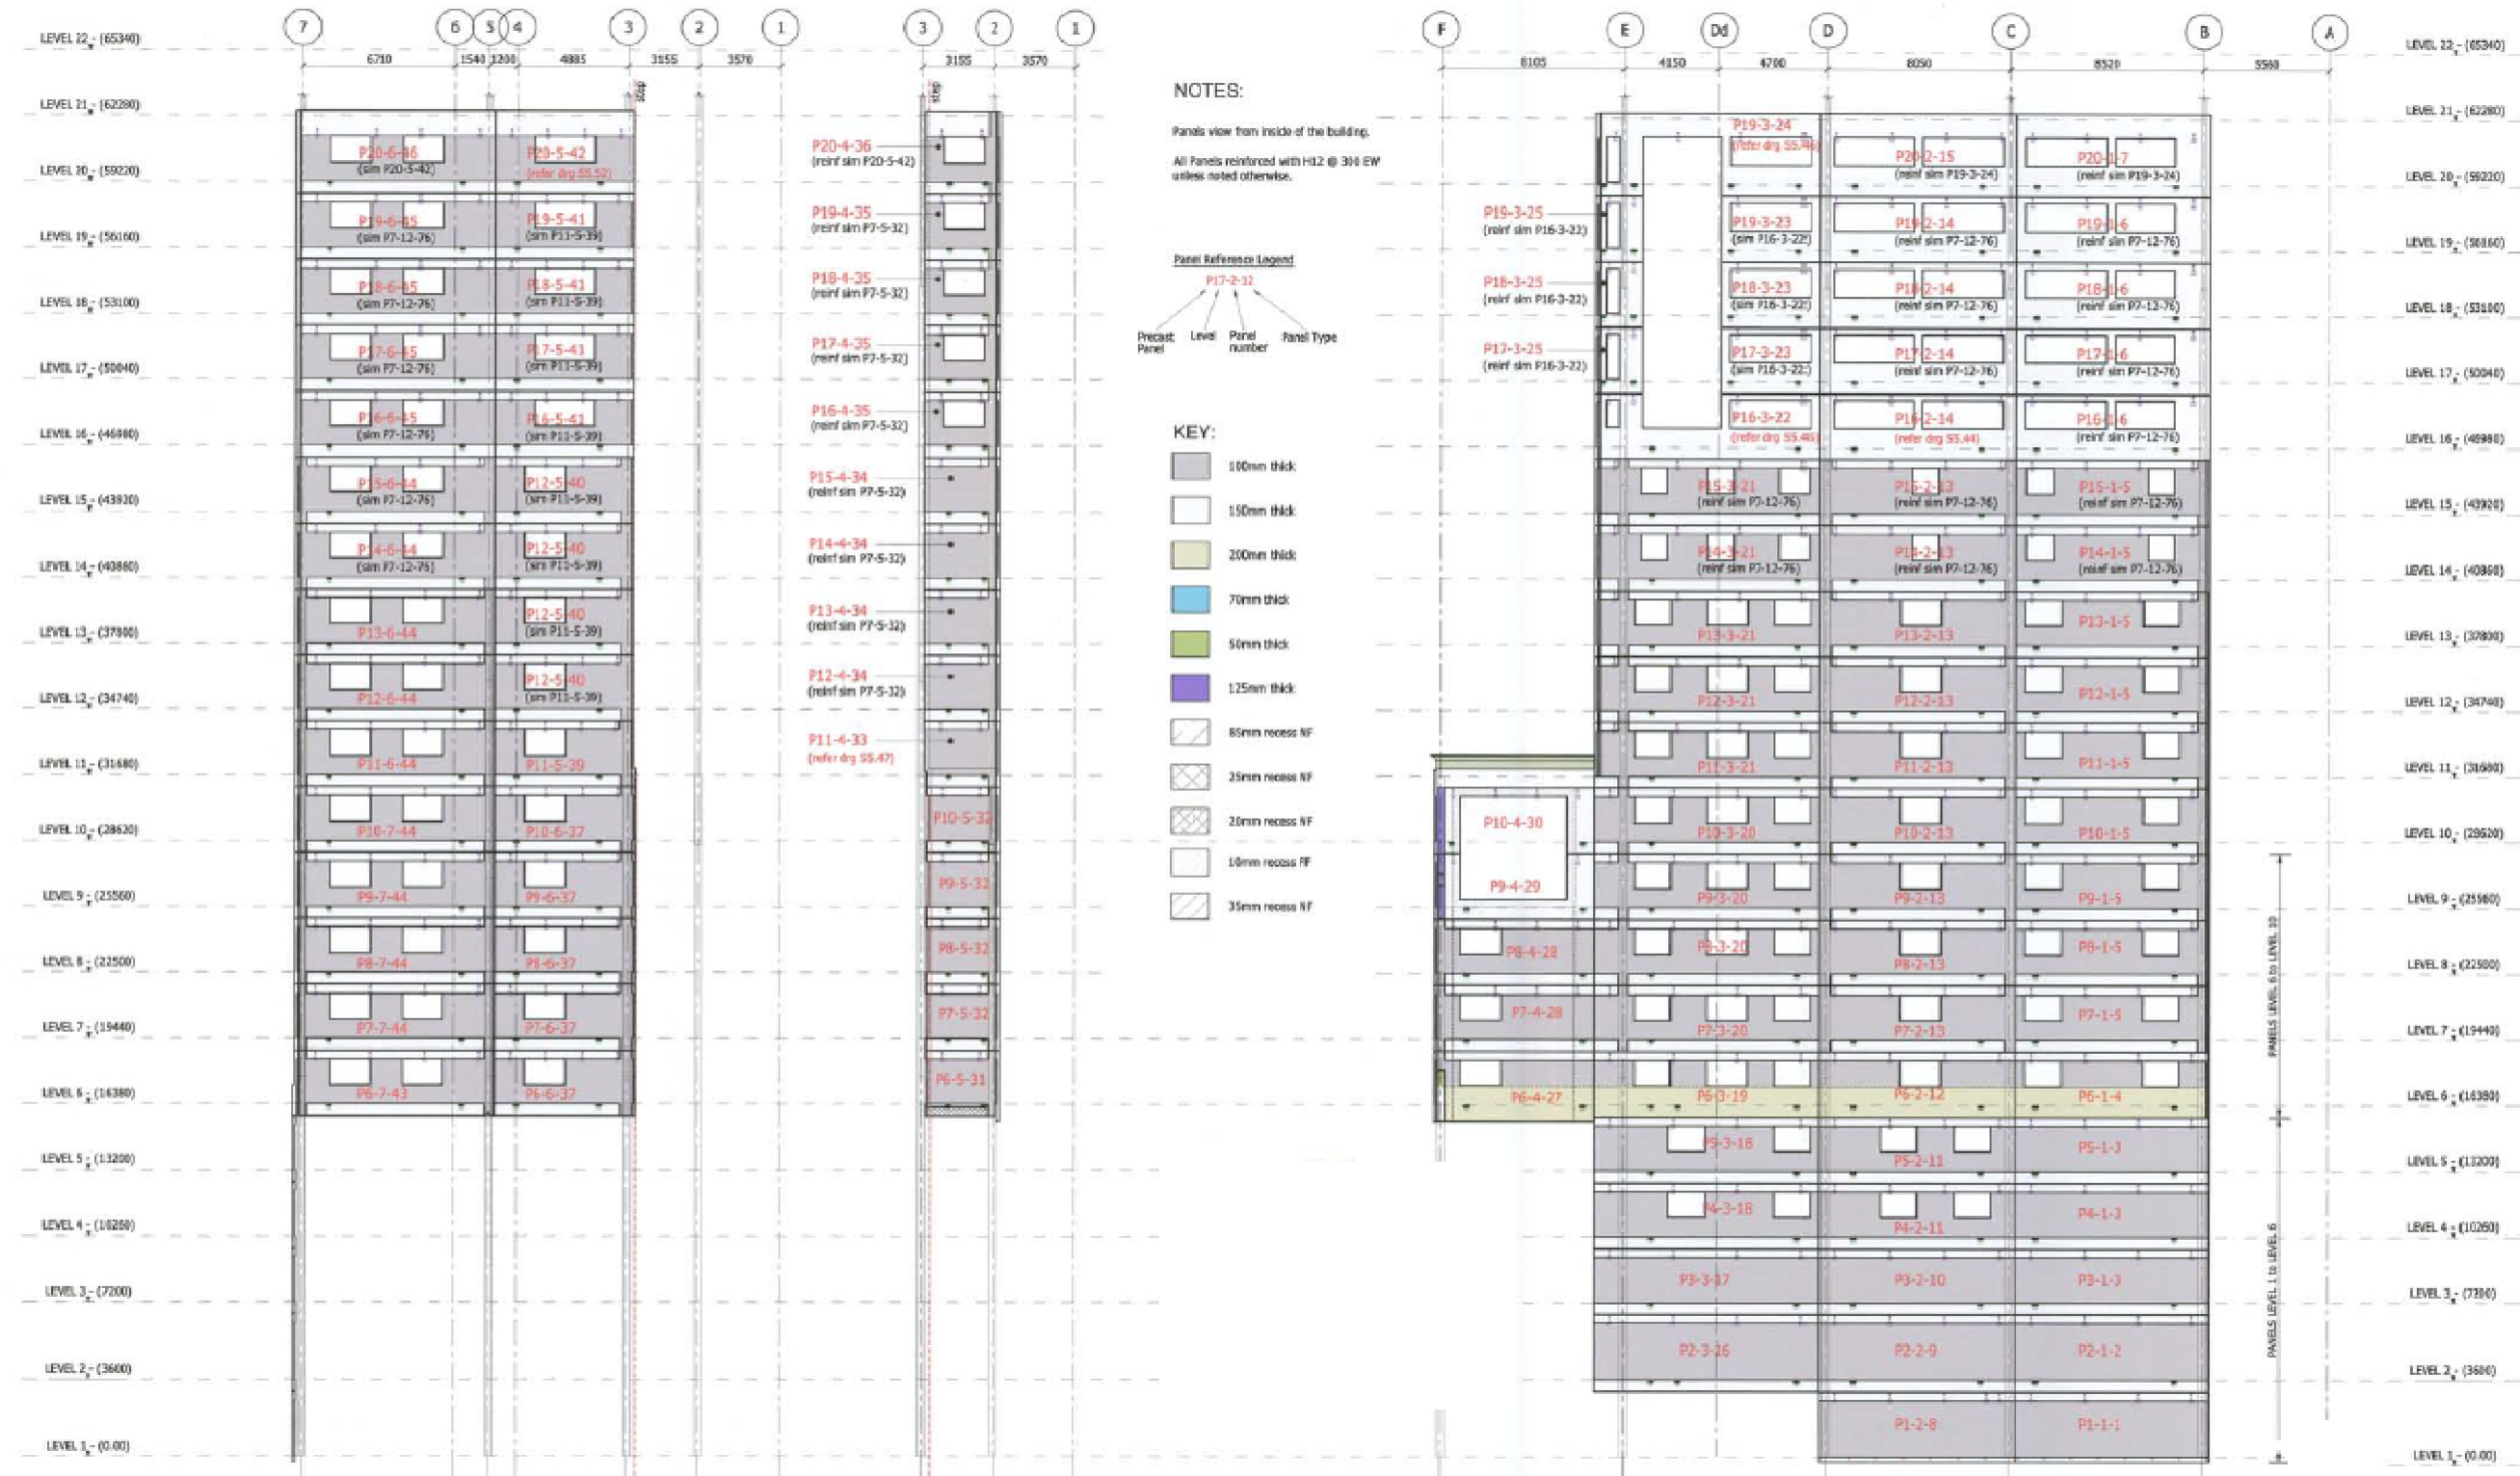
South wall grid B, near grid B and East wall grid 7 panel elevation
